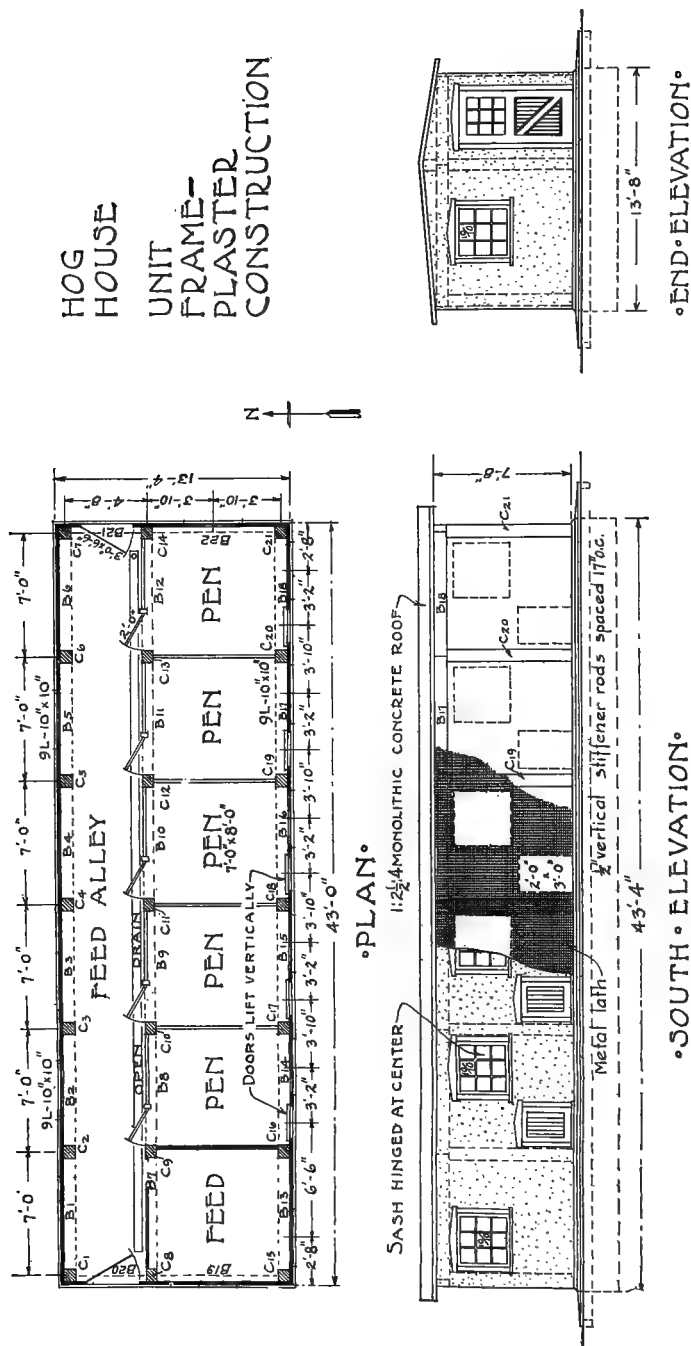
Plan and Elevation of a Cement Plaster Hog House with Reinforced Concrete Frame.
